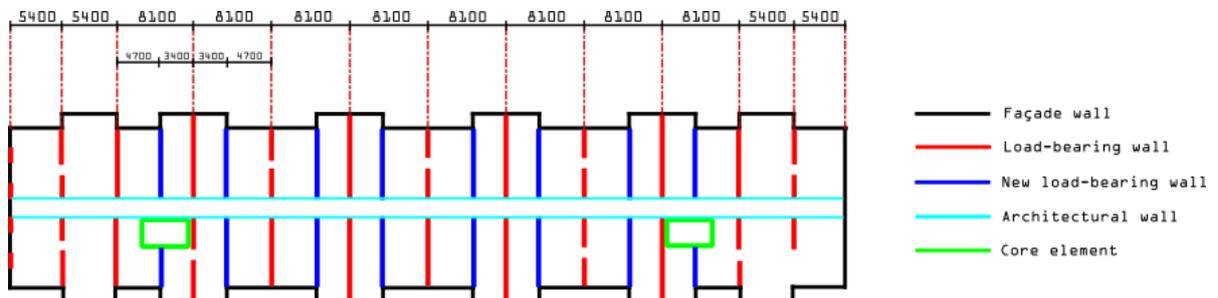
Example Solution for Replacing Architectural Walls by Load-Bearing Walls to Reduce Floor Span
